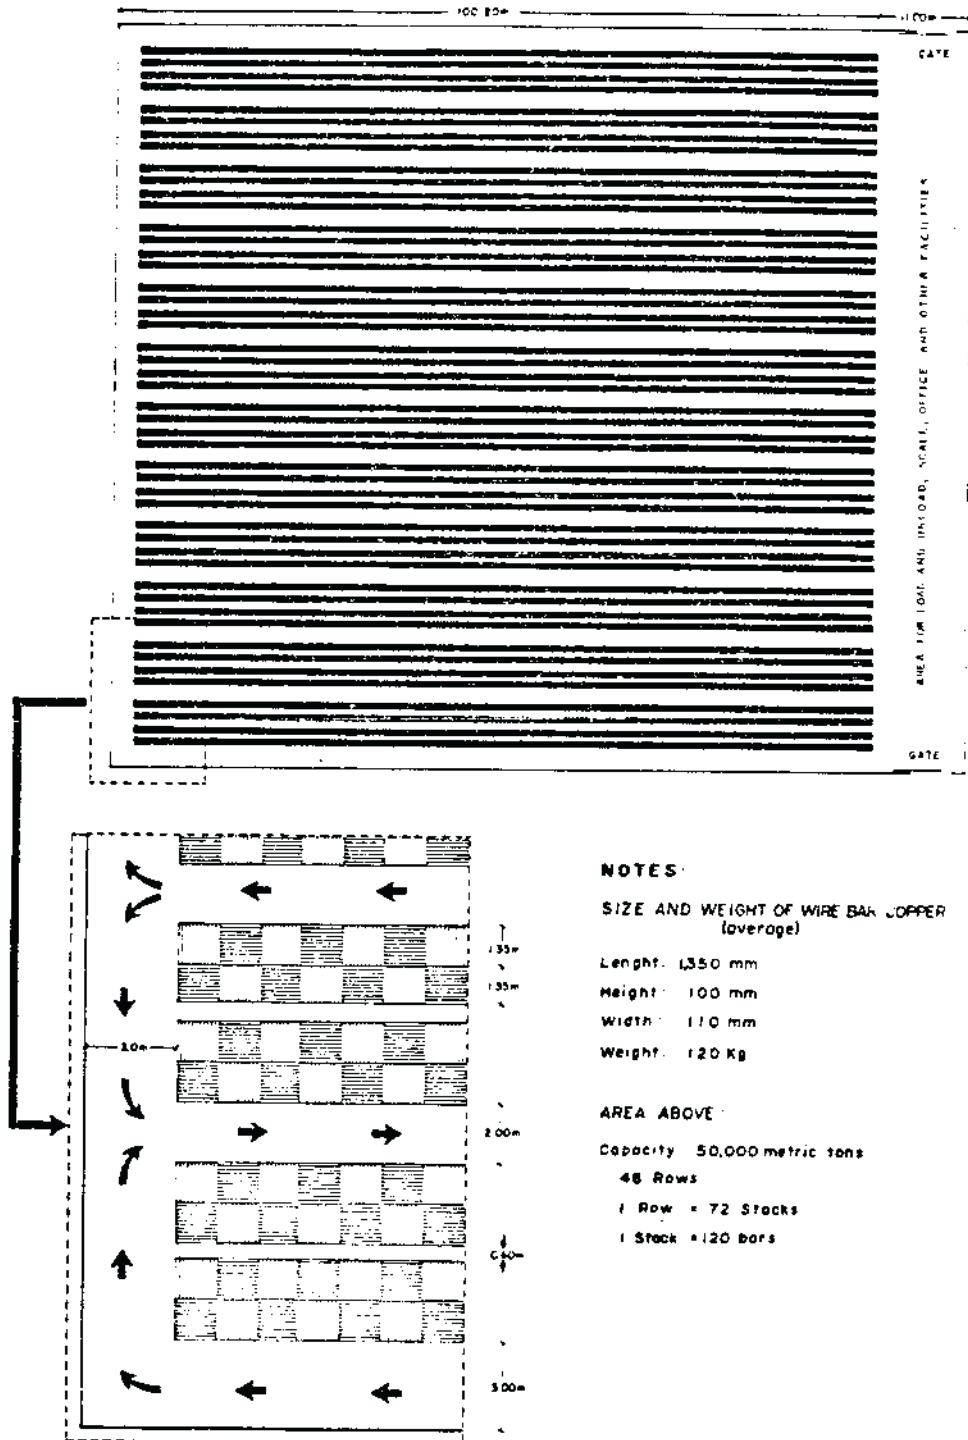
PLAN OF AN AREA FOR STORAGE OF WIRE BAR COPPER
